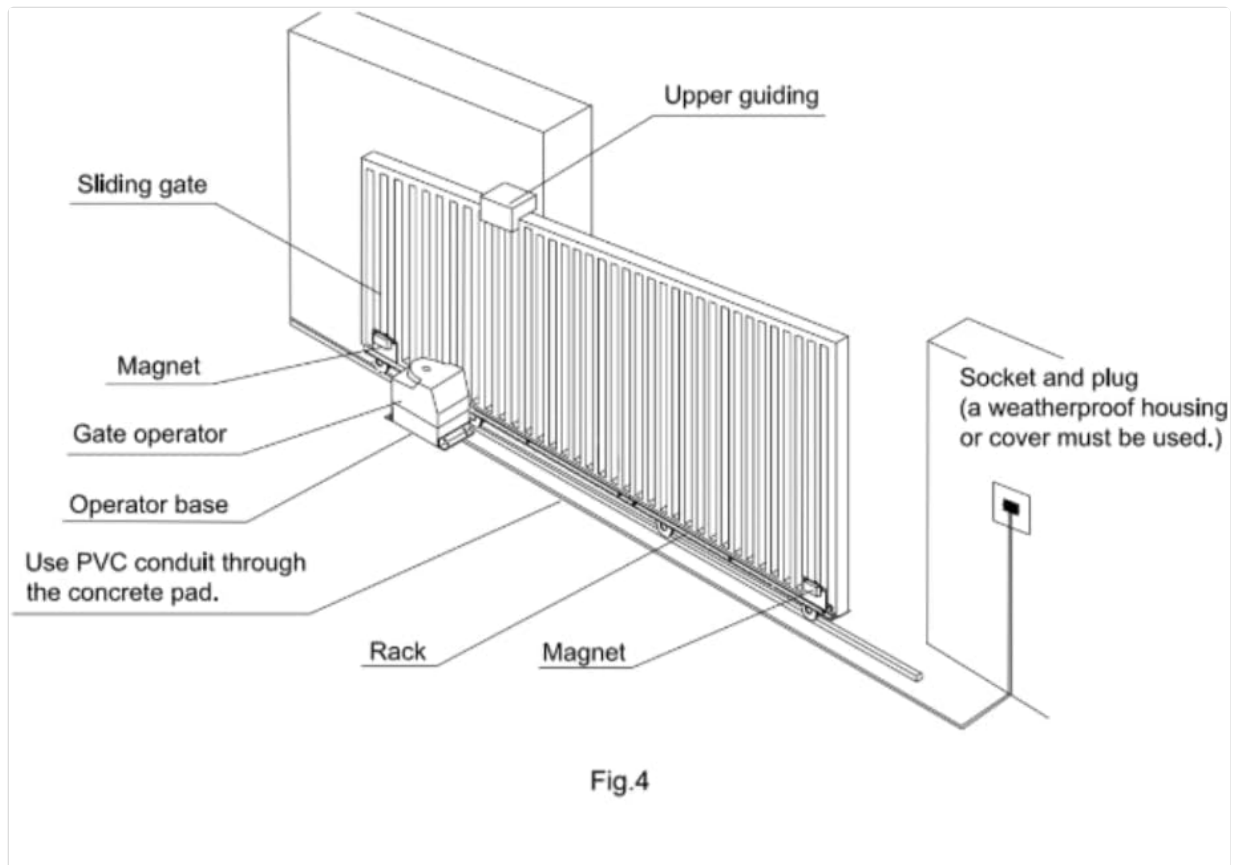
, an installation diagram illustrating the placement of the gate operator, gear rack, magnets, and upper guiding for a sliding gate system. It also shows the recommended use of PVC conduit for electrical wiring.
